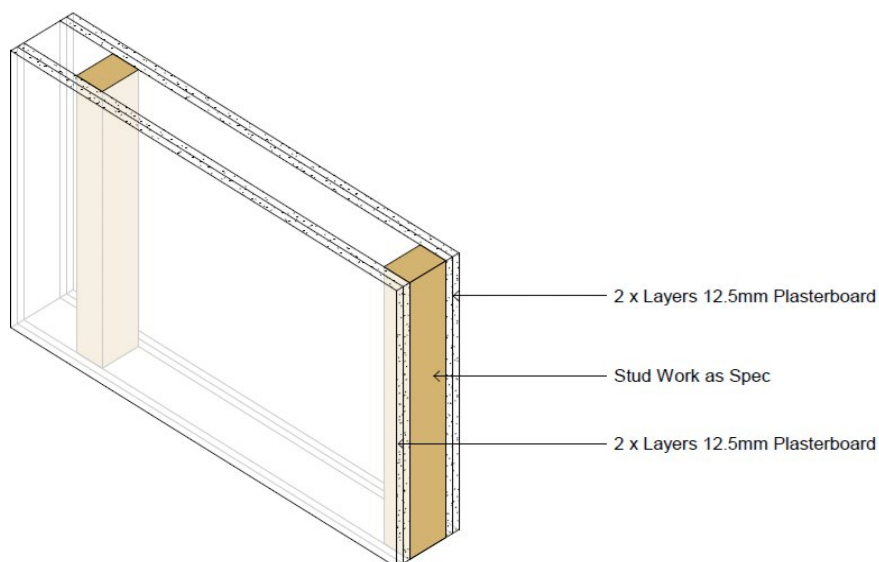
Example of a 60-minute FR stud wall detail.
